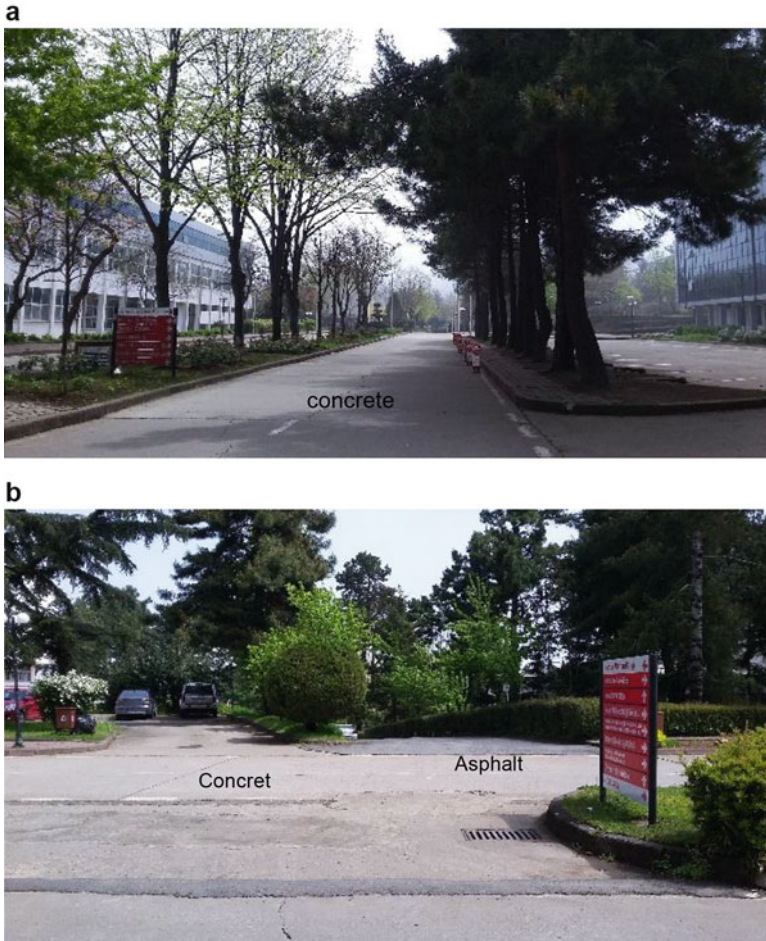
Photo image of the university campus and asphalt concrete pavements where the works were taken
